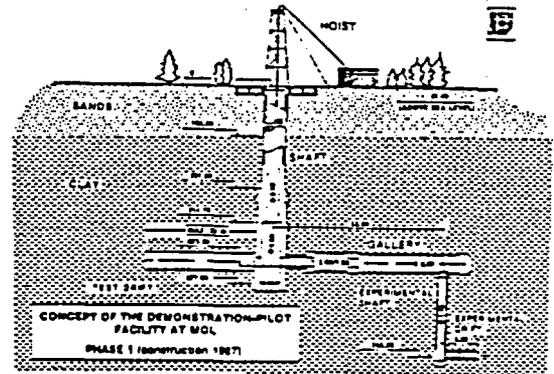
CONCEPT OF THE DEMONSTRATION TEST DRIFT AS IT WILL BE CONSTRUCTED IN THE VICINITY OF THE UNDERGROUND LABORATORY
